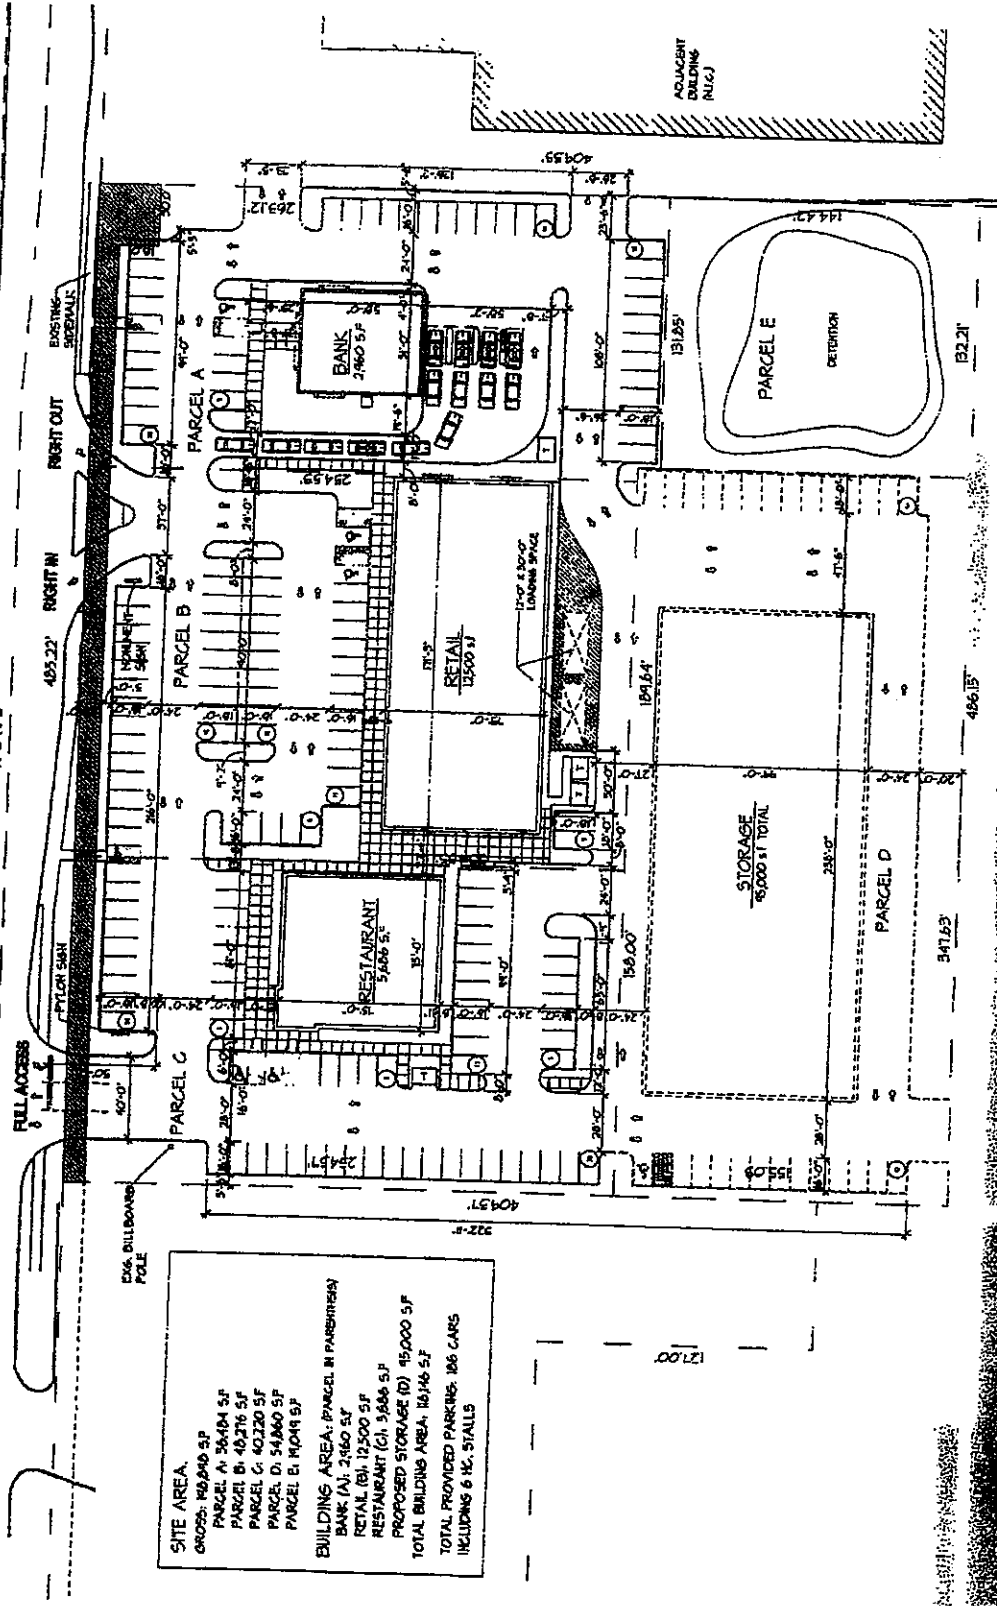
EXHIBIT I: PREVIOUSLY APPROVED PLANS
